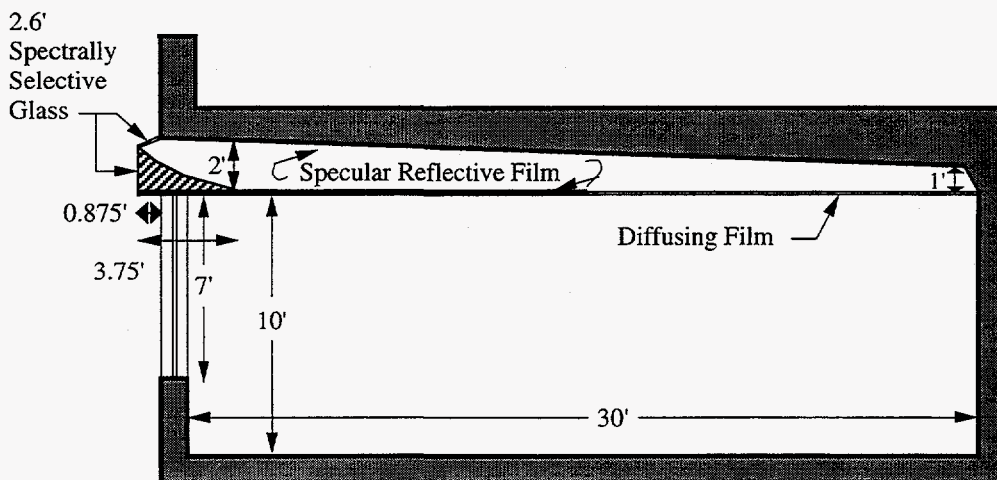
Section of trapezoidal light pipe design (Light Pipe C).
